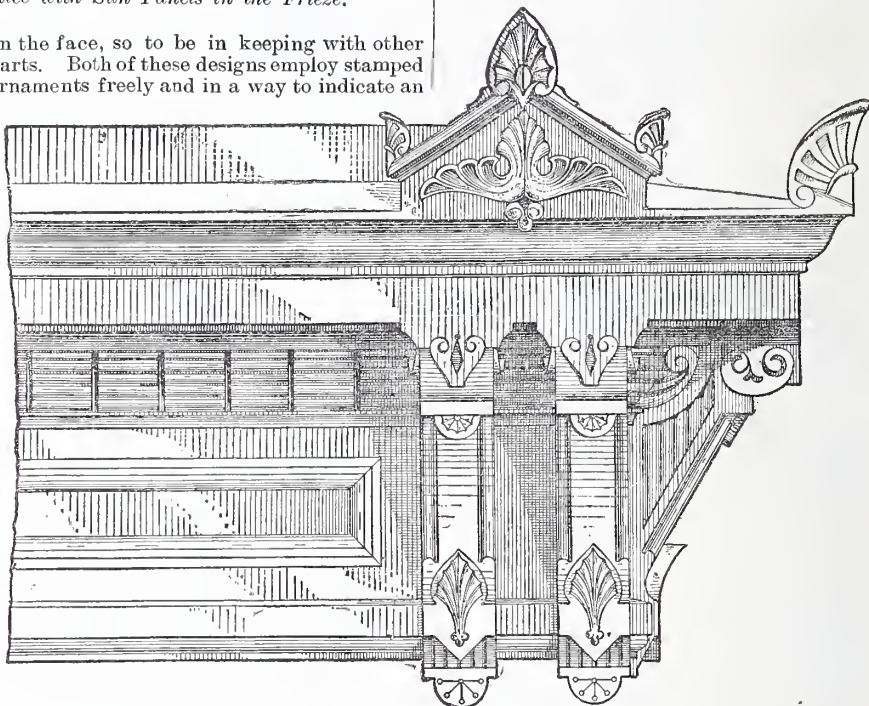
Cornice with Fancy Brackets, Molded Dentil Course, Paneled Frieze, &c.
